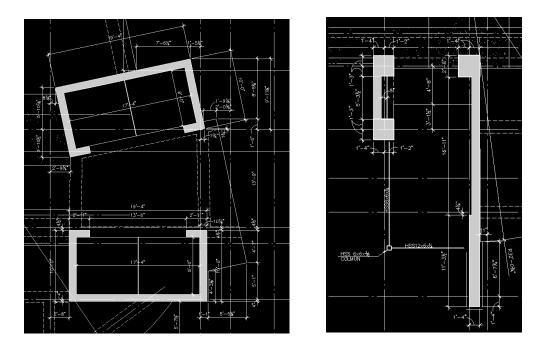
Figure L. Left – Shear wall located at elevator shafts. Right – Shear wall located at stairwells.
